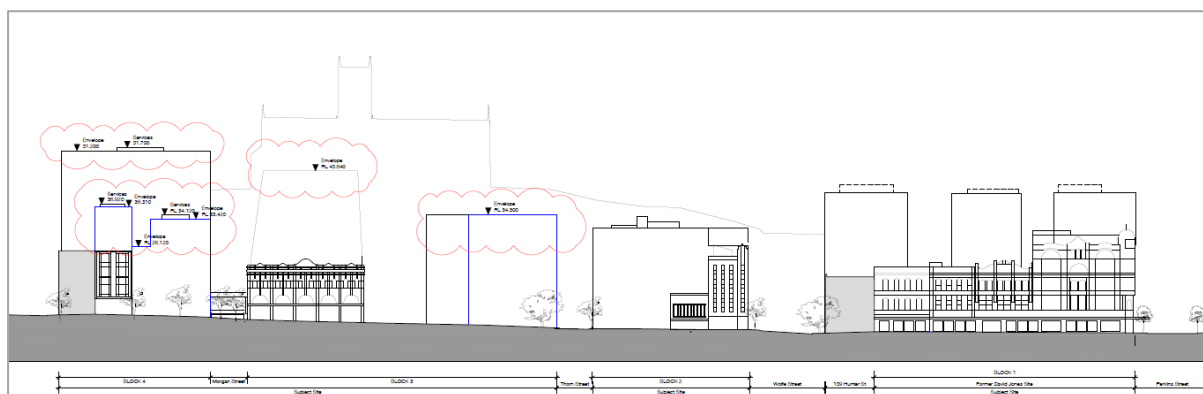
Excerpt of proposed modified building envelopes per MA2023/00175, Hunter Street elevation. Source: SJB
